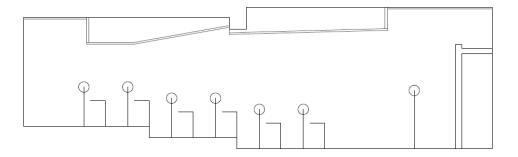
Section of Lecture Hall – Proposed Ceiling Reflectors
